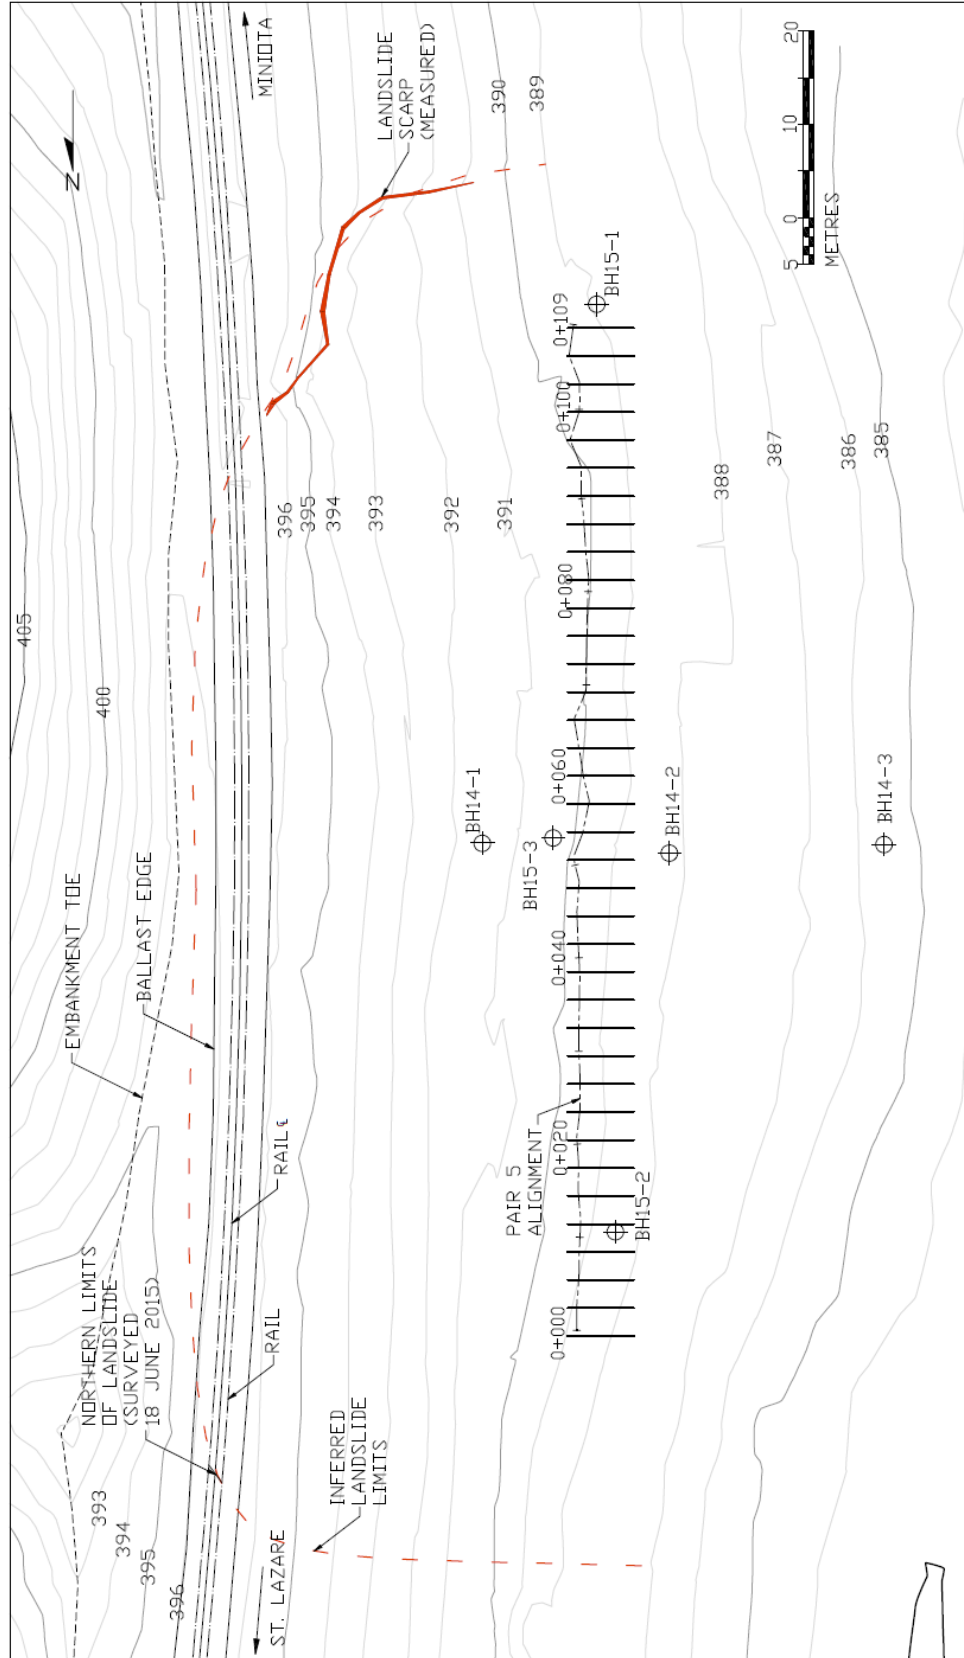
Plan view showing as-built layout of sheet pile walls.
